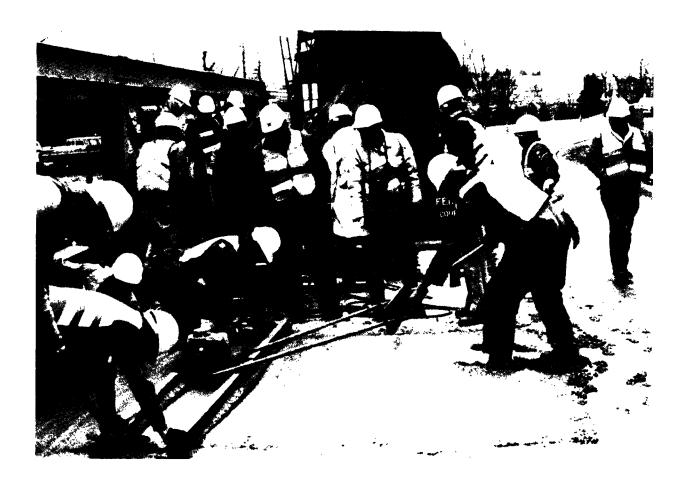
Special blended cement ready-mix concrete is used to replace a segment of the top half of a bridge deck during an 8-hour lane closure
